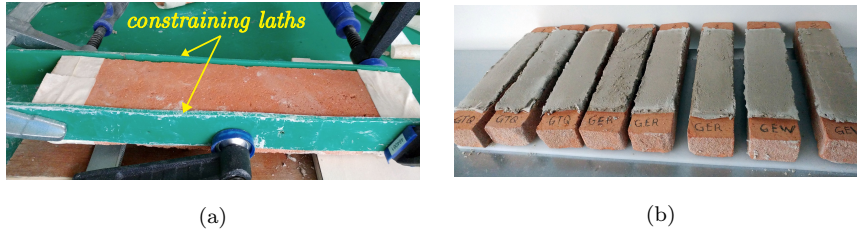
Three-point bending test specimen manufacture: (a) brick support with constraining laths (b) laminated specimens
